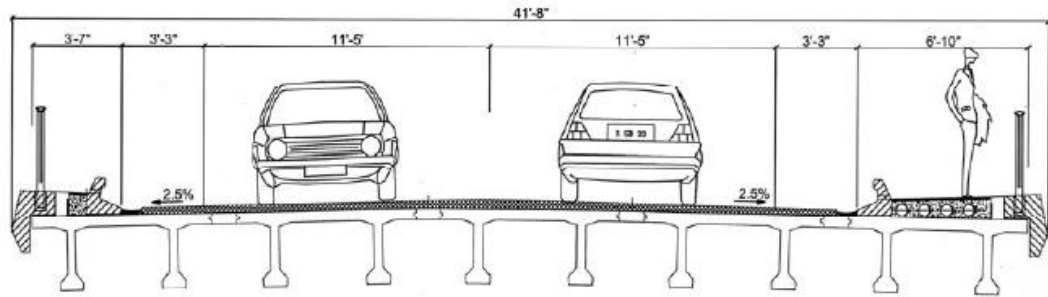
Typical cross-section of Bourg-lèsValence bridges [104]
